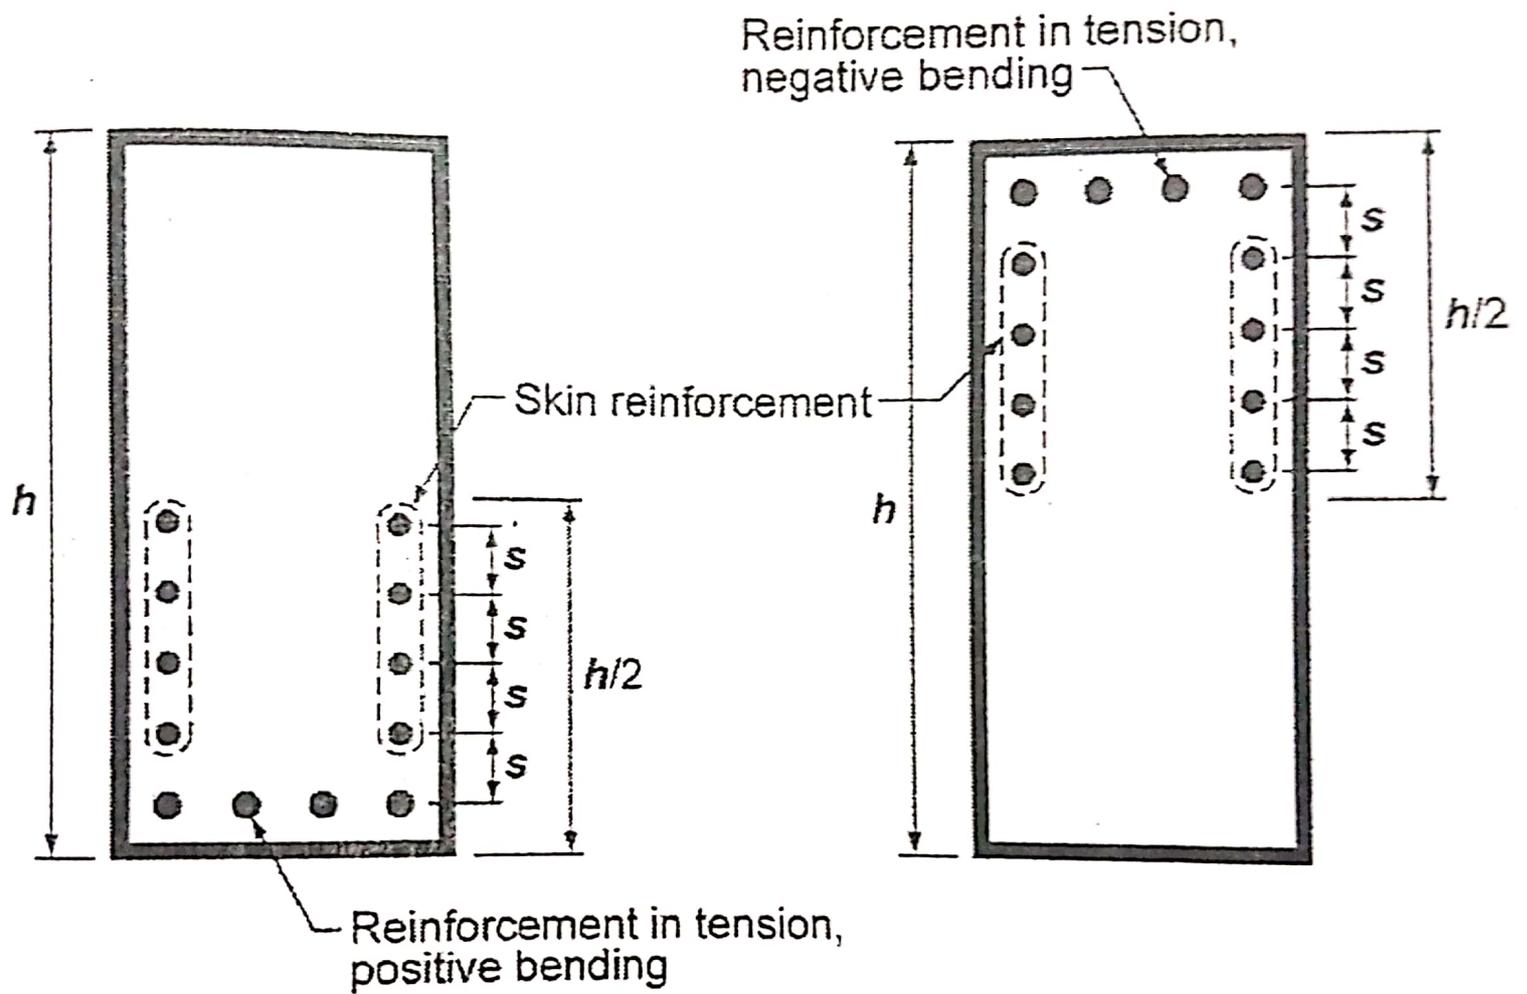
Skin reinforcement for beams and joists with $h > 900$ mm.
